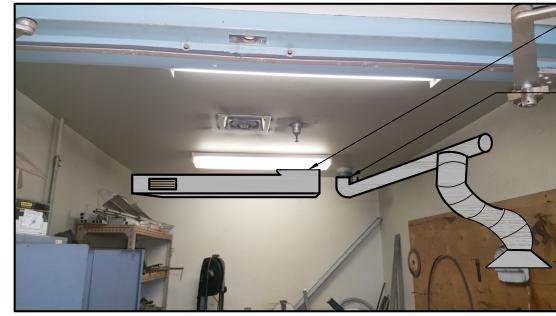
EXISTING DUCTWORK TO BE USED FOR CONNECTION TO WELDING EXHAUST -WELDING ROOM 108.
